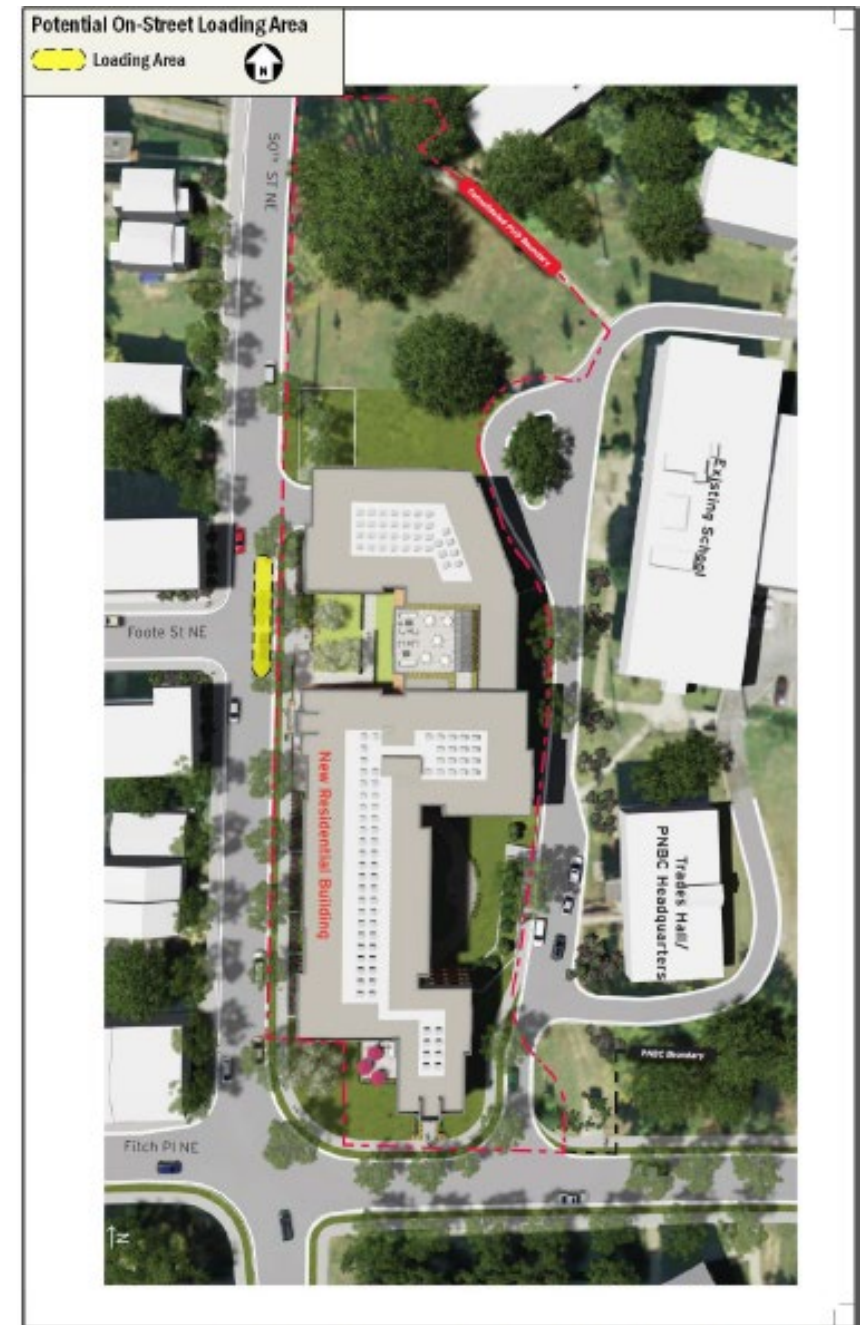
Potential On-Street Loading Areas for Trucks taller than 12'-6"
